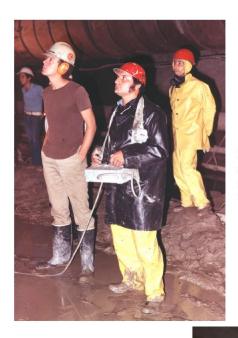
Shotcrete operator using a remotely controlled unit to apply shotcrete to a rock face in a large civil engineering excavation.
